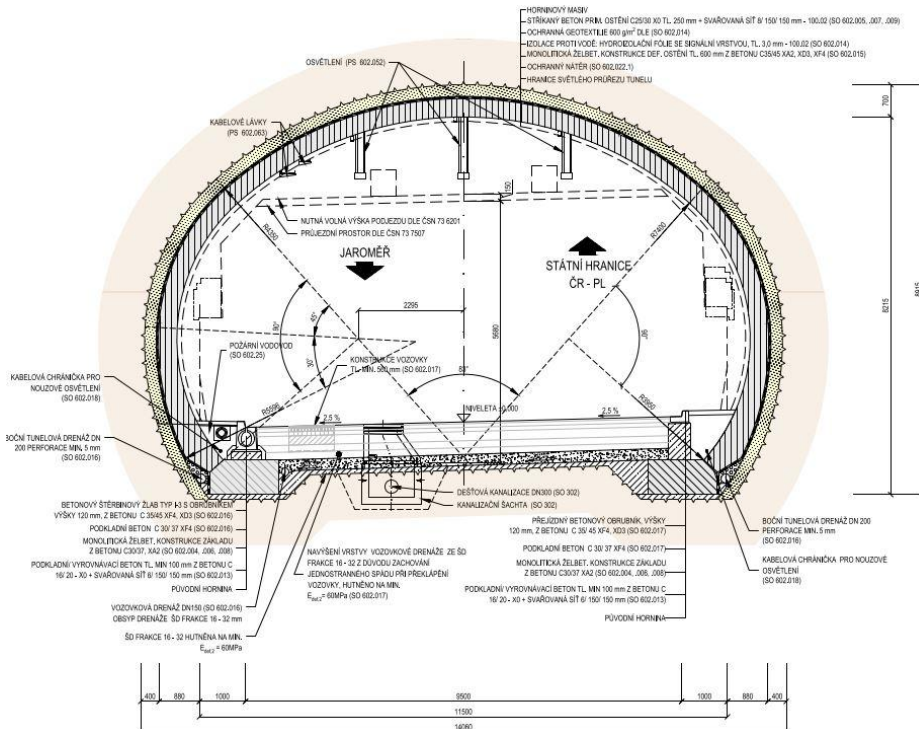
Typical cross-section of the mined section of the Dolní Radechová Tunnel
